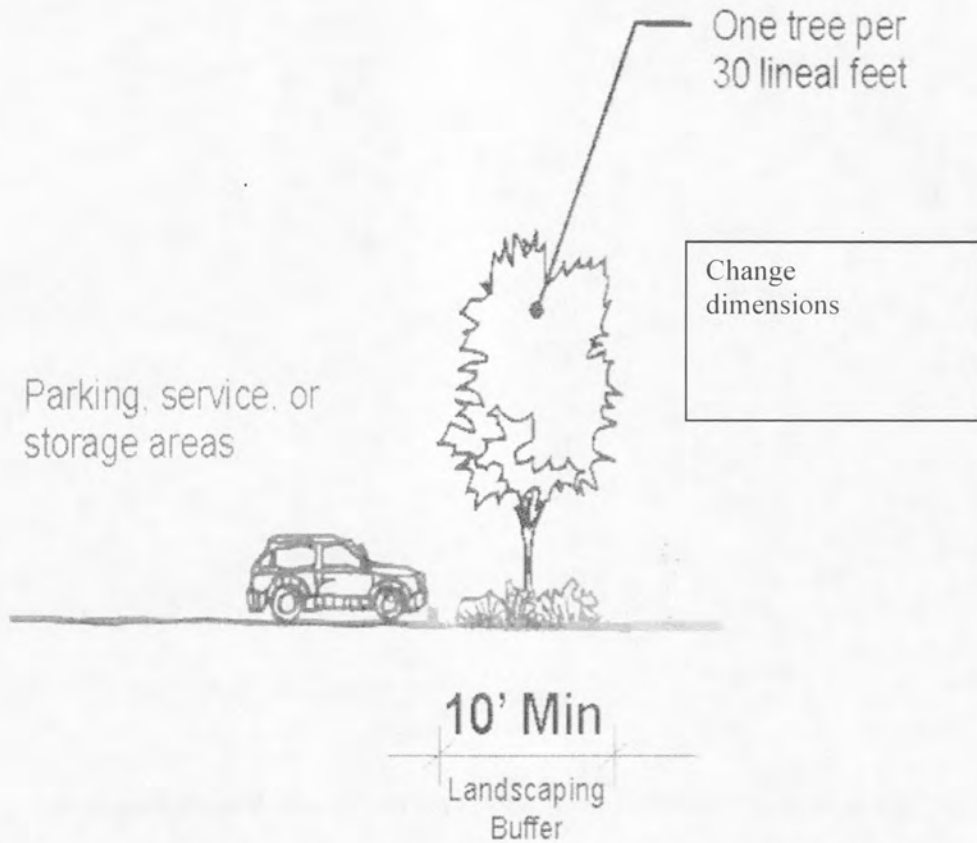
Illustration of requirements for landscaping between a street and parking lot
